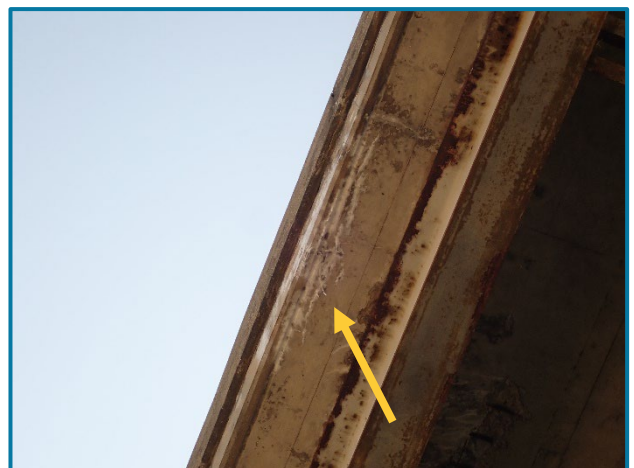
Heavy cracking and efflorescence throughout the bottom edge of the east overhang in Span 26B (looking up and south).
